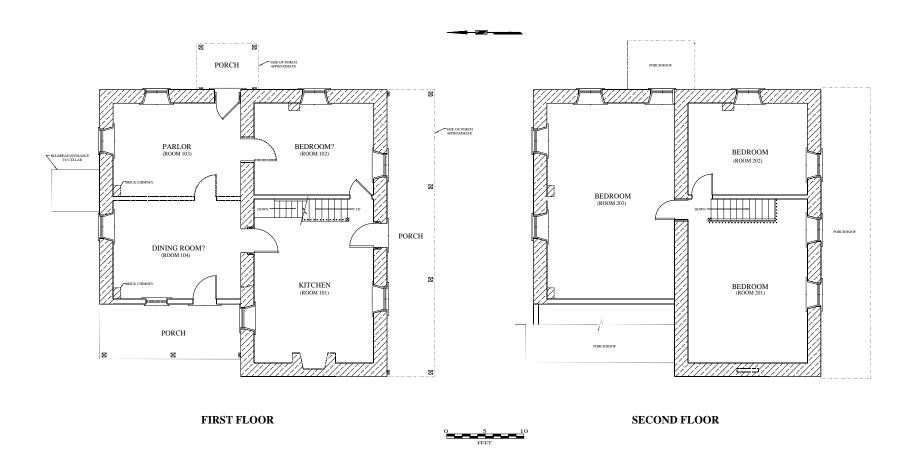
First and second floor plans of the Howarth House, showing the construction of the north wing (circa 1860).
